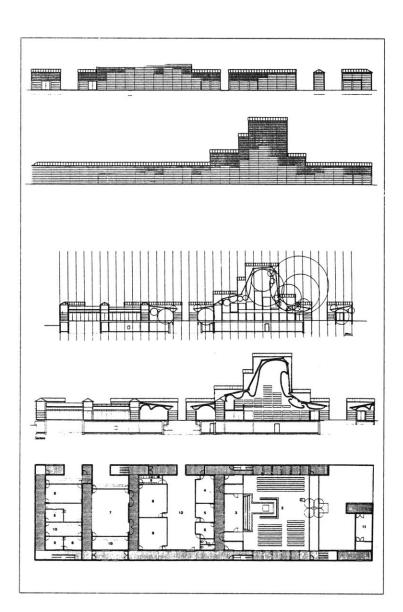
Bagsvaerd Church, folded roof in main hall.
